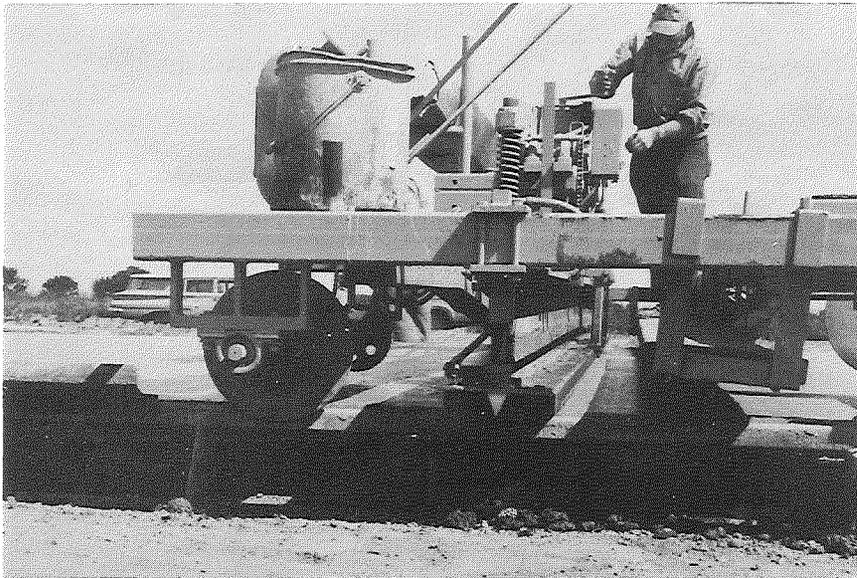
Unitube planter used to install Unitube, 1/4 by 2 in. premolded filler strips, and for vibrating at the locations of sawcut to form plane-of-weakness.
